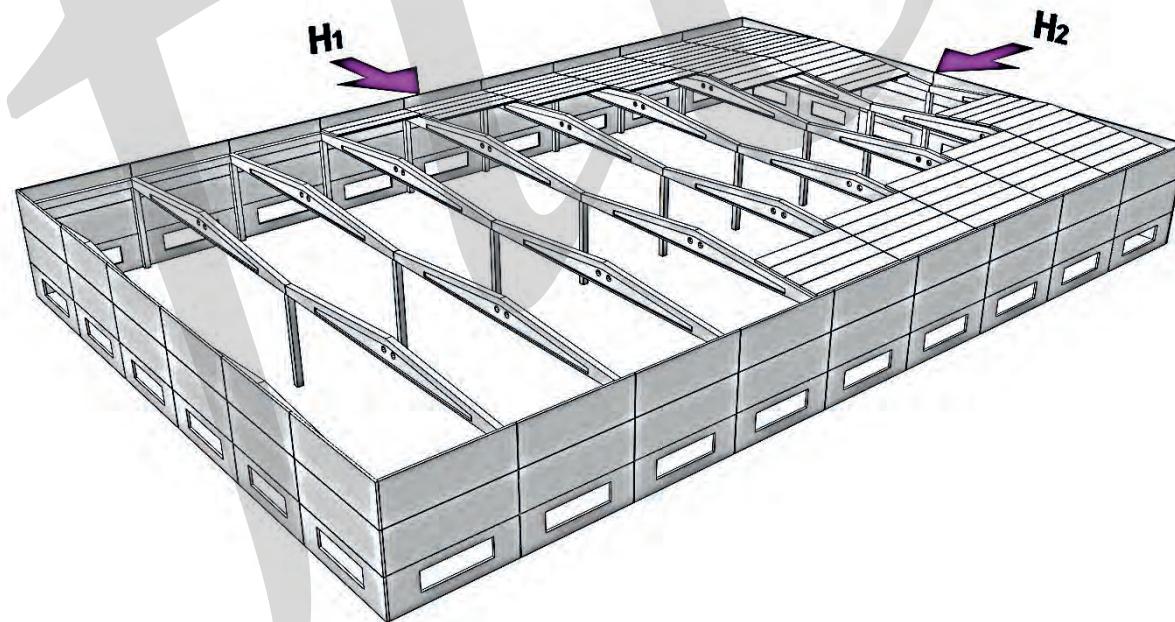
For horizontal stability, interaction between the columns can be achieved by diaphragm action of the precast roof
